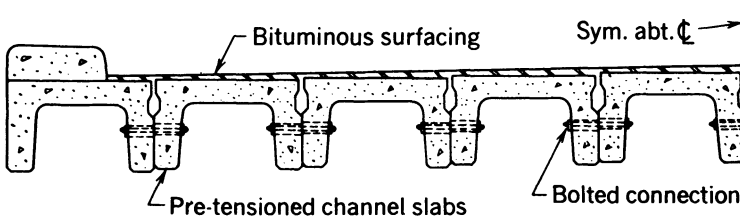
Half-section of a bridge with precast prestressed-concrete channel slabs.
